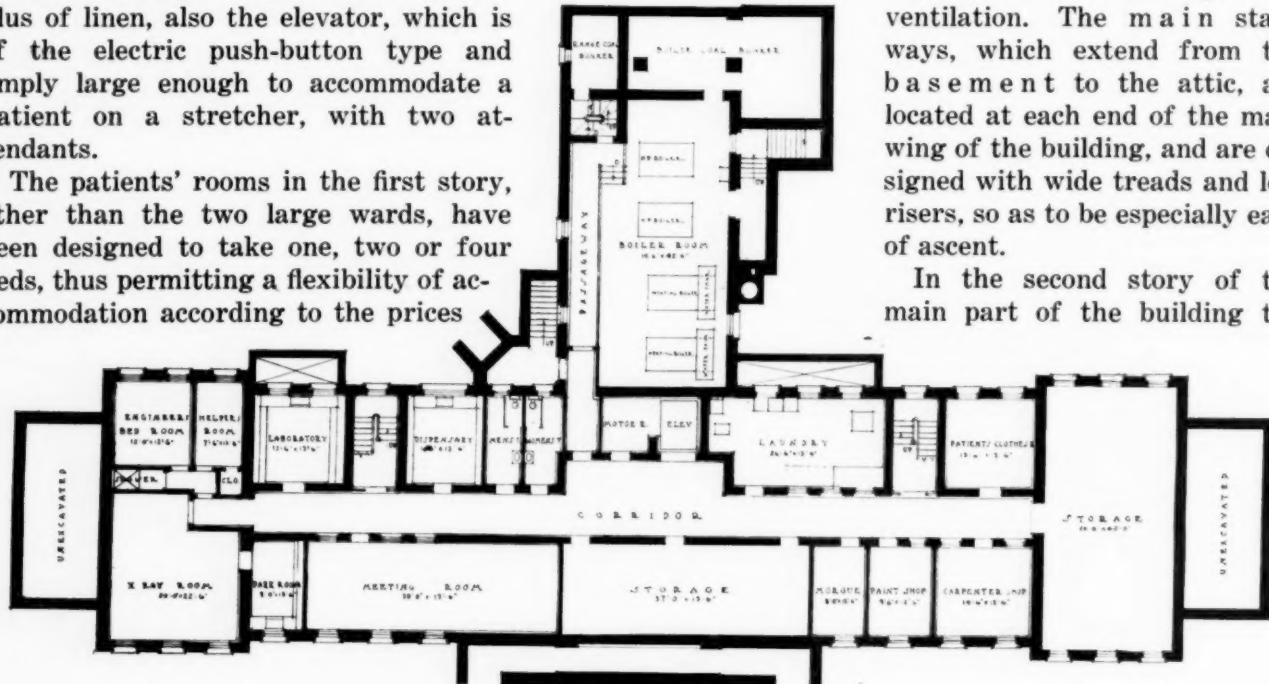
Basement floor plan. The Henry W. Putnam Memorial Hospital, Bennington, Vt.
